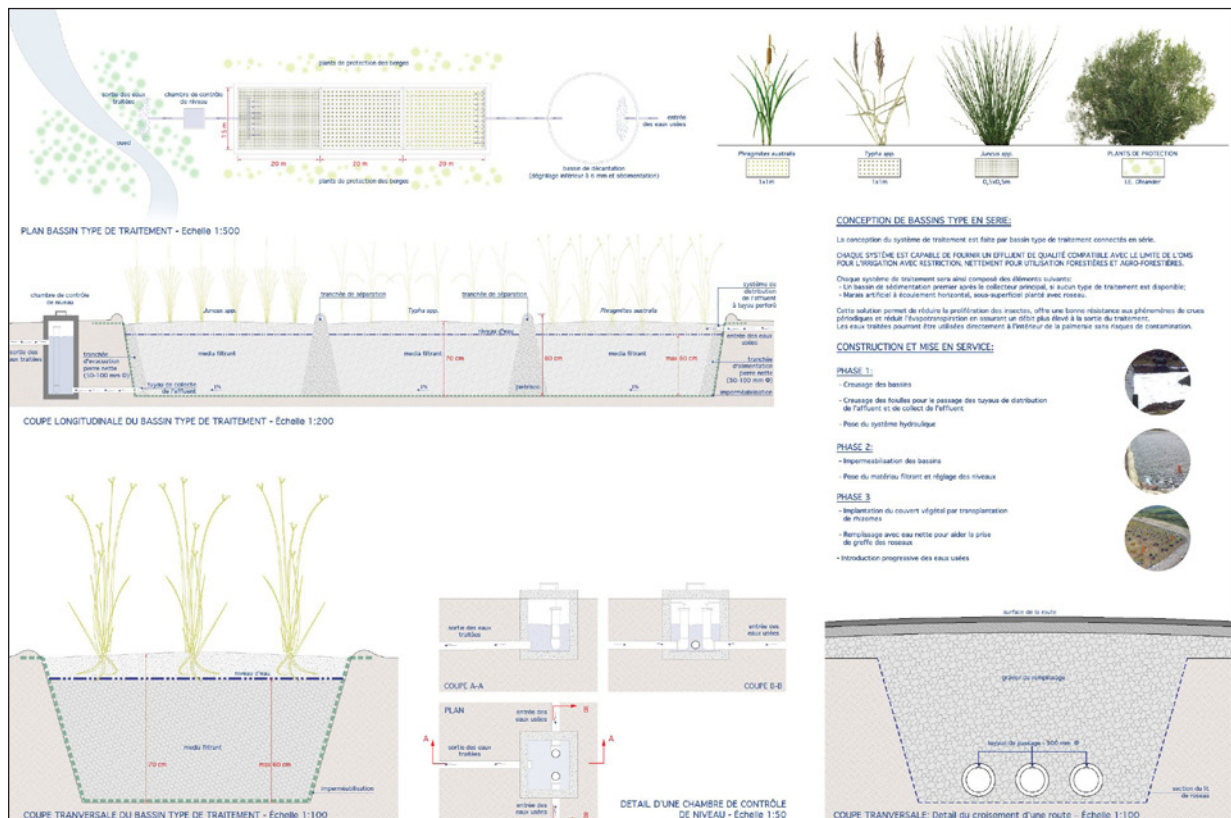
Taghit (Algeria) – scheme of treated wastewater: plan and sections.
